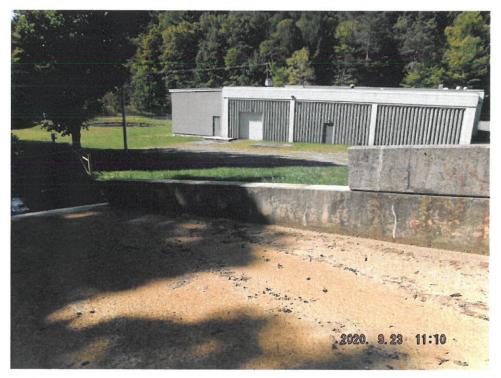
Recently Removed Upper Section of the Western Spillway Wall (EMA operational staff removed portion of wall in 2019)
